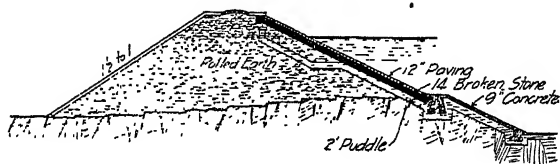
Section of Reservoir Embankment, Pittsburg.
